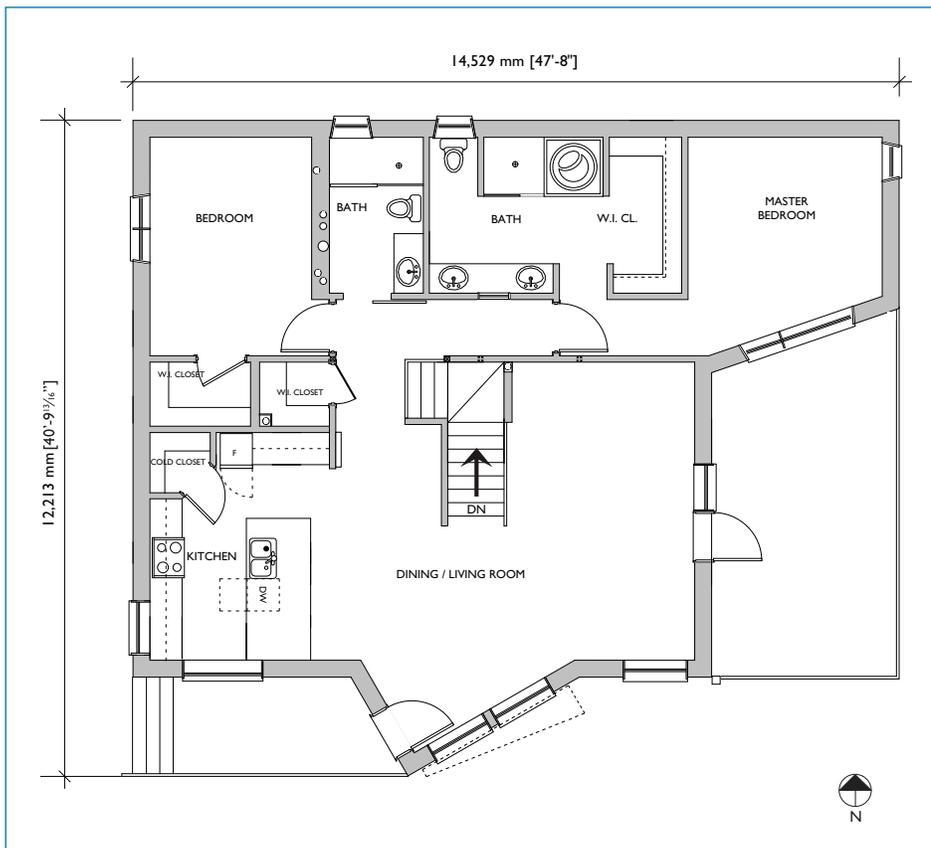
Main floor plan of the EchoHaven EQUilibrium™ Project
